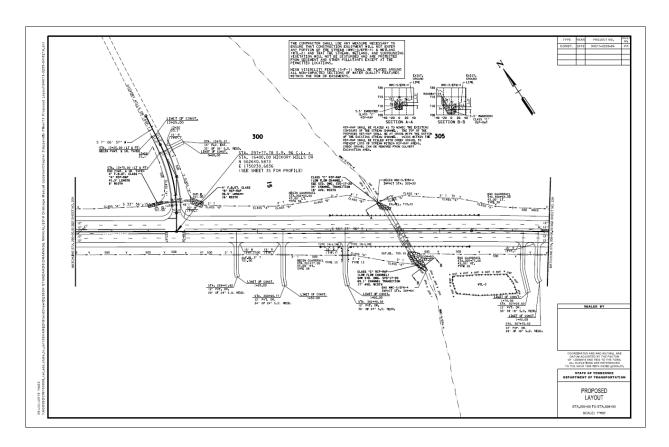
A-12A Example of Proposed Layout w/ Box Culvert
